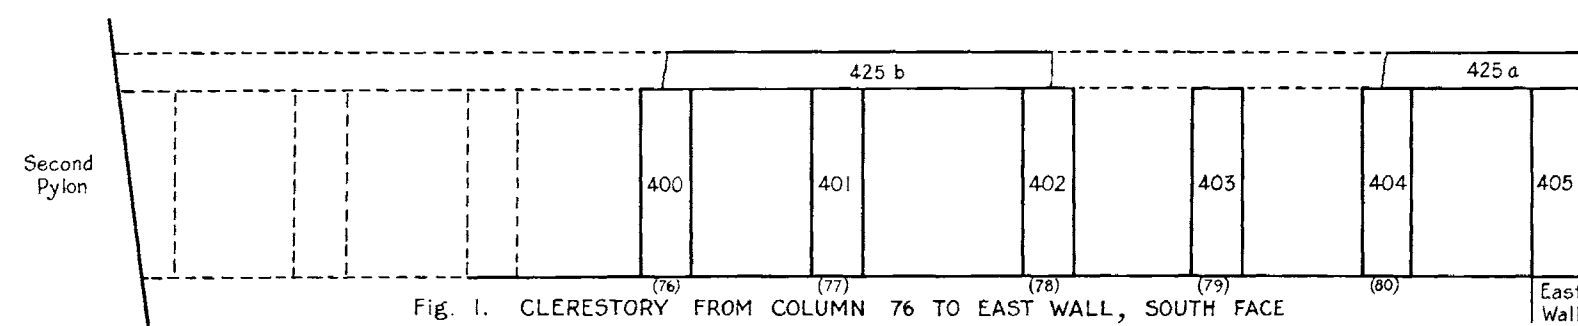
CLERESTORY FROM COLUMN 76 TO EAST WALL, SOUTH FACE
